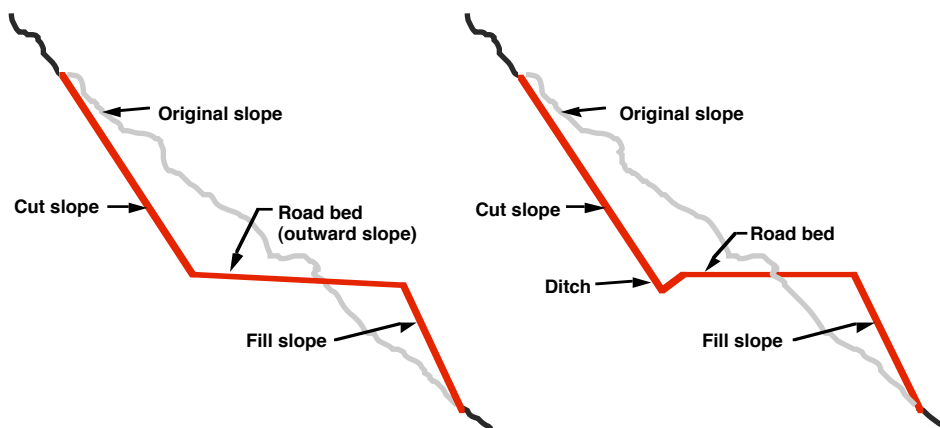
Typical road sections cut into hillside, with and without ditch for water conveyance.
